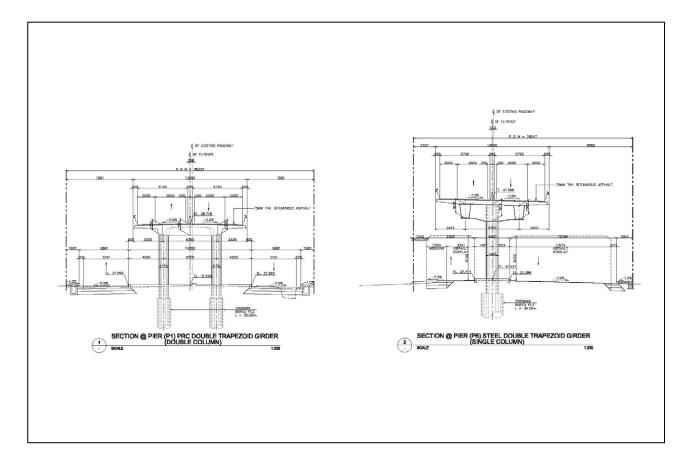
TYPICAL CROSS SECTION (PETERONGAN)
